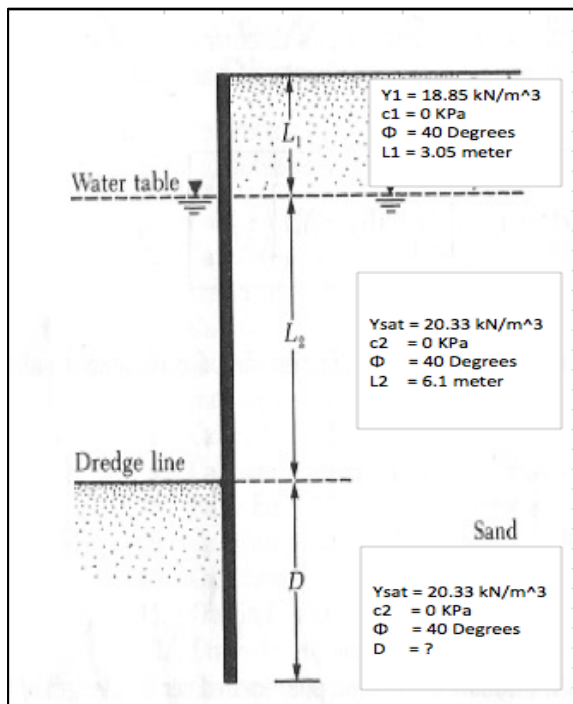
Cantilever Sheet Pile penetrating sand [2]
